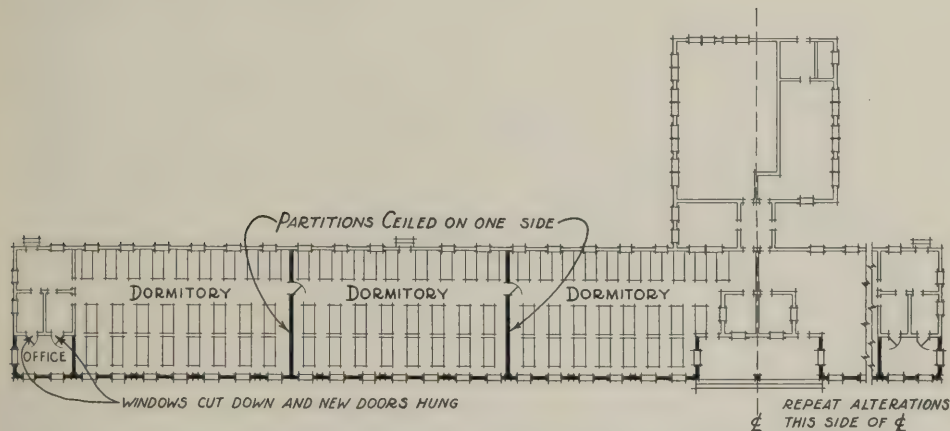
Floor plan modified aviation barrack, as altered August, 1917, to include former porch, and divided into dormitories holding 25 men each; allowing 59 square feet of floor space and 539 cubic feet of air space per capita
